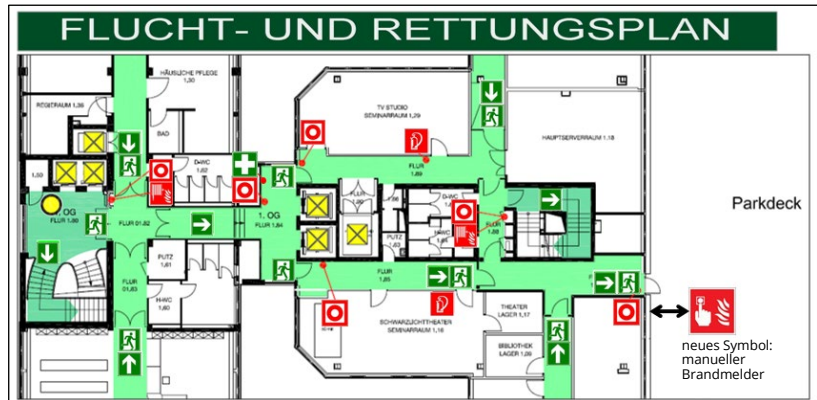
Example Emergency Escape and Evacuation Plan (Alexanderstr. 1, first floor)
